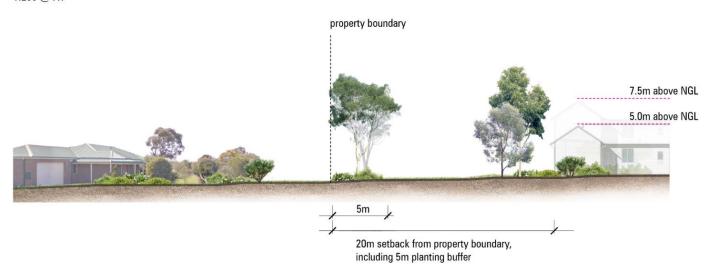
Sectional diagram of south-west interface with existing dwellings in Hopetoun Park
